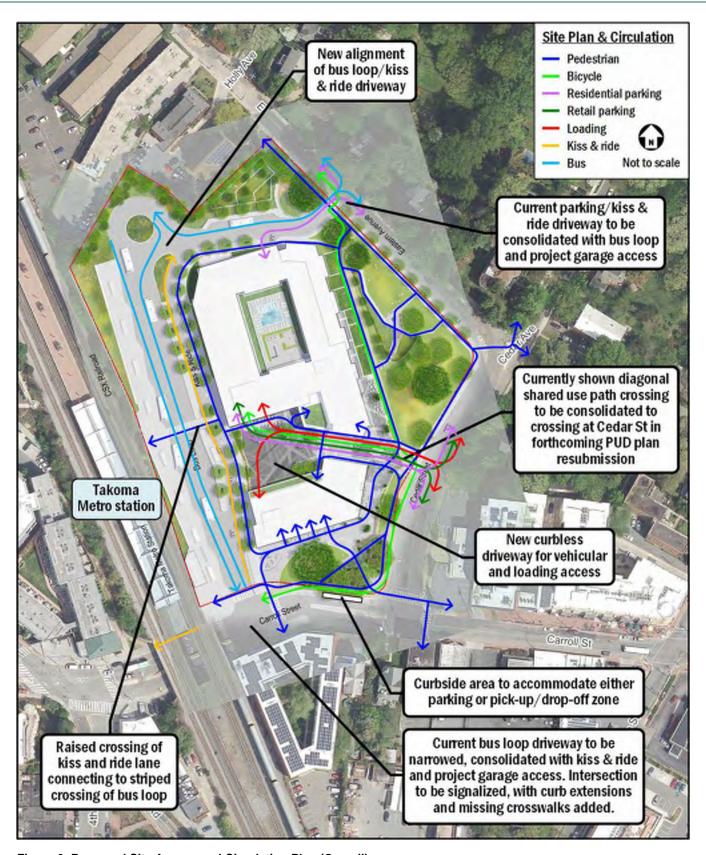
Proposed Site Access and Circulation Plan (Overall)
